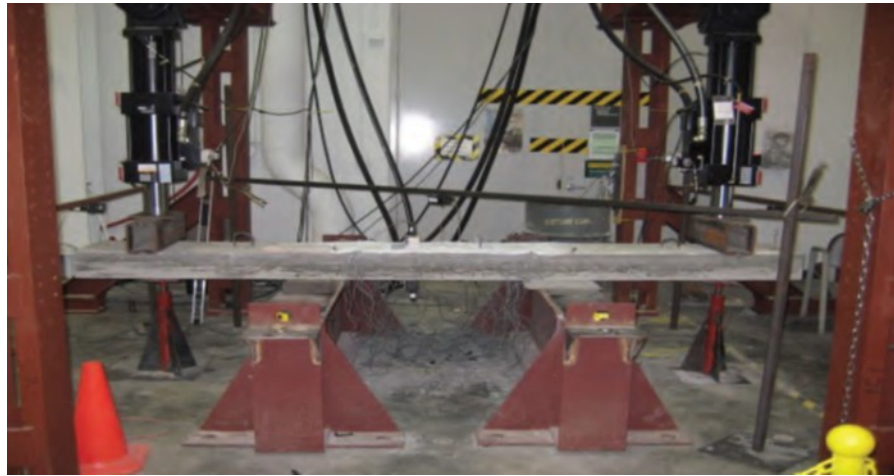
The flexural test setup and specimen dimensions (Ma et al. 2012)
